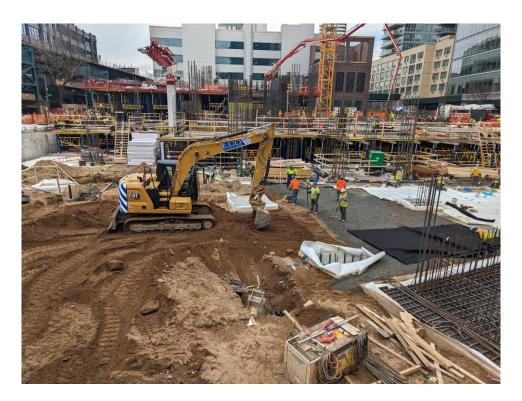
ECD excavating in the southwestern part of the site (facing north).
